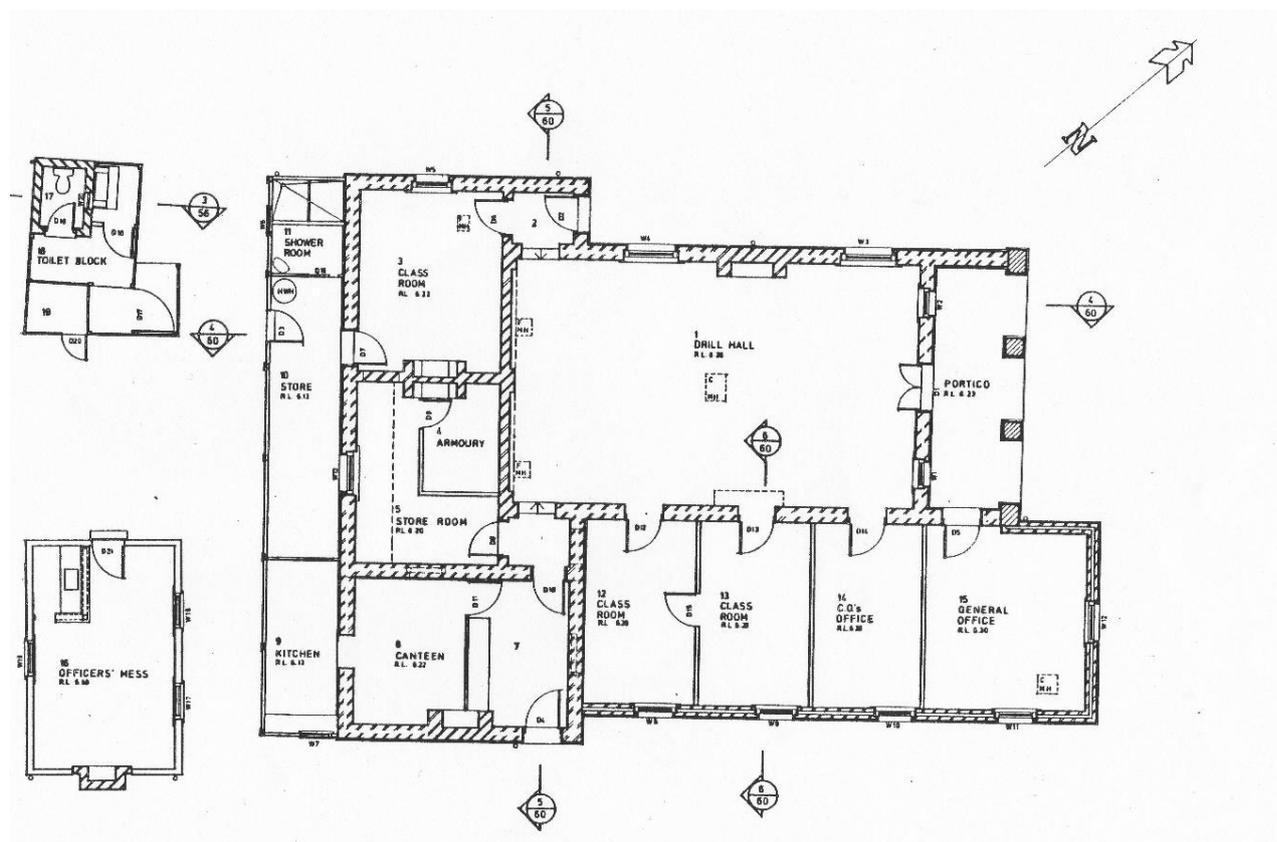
Floor plan - Proposed Conservation Works and New Use (Dwg. 18 of page 98 of the EC & CM Jones Report 1987)
